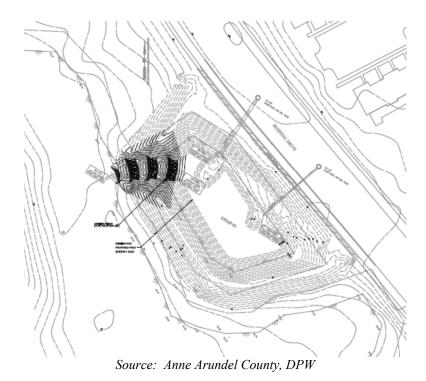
Design Option Example: Decommissioned Pond with SPSC Outfall System
